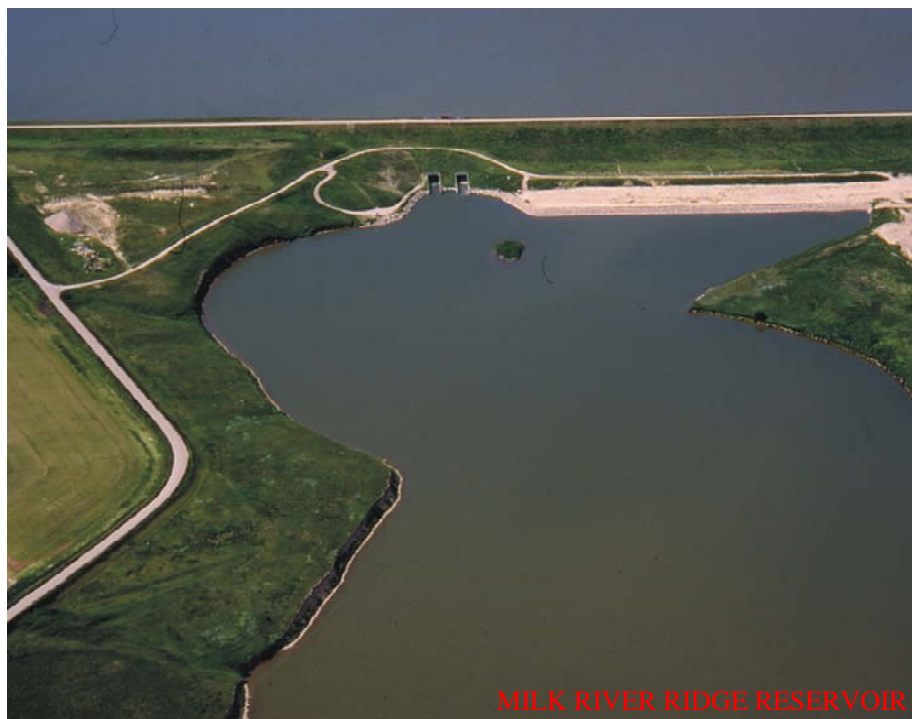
Milk River Ridge Reservoir. Photo: Alberta Environment
